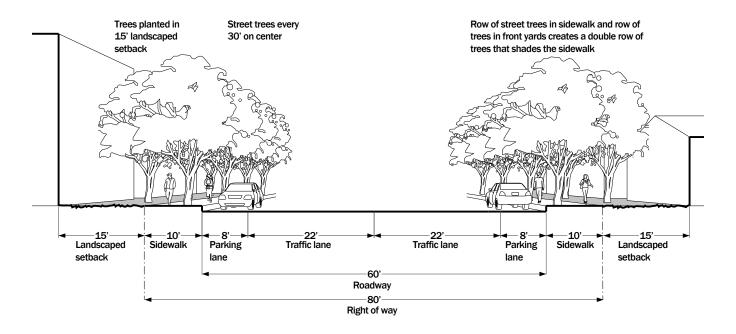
Downtown Retail South: Other Street Enhancements (C Street)
